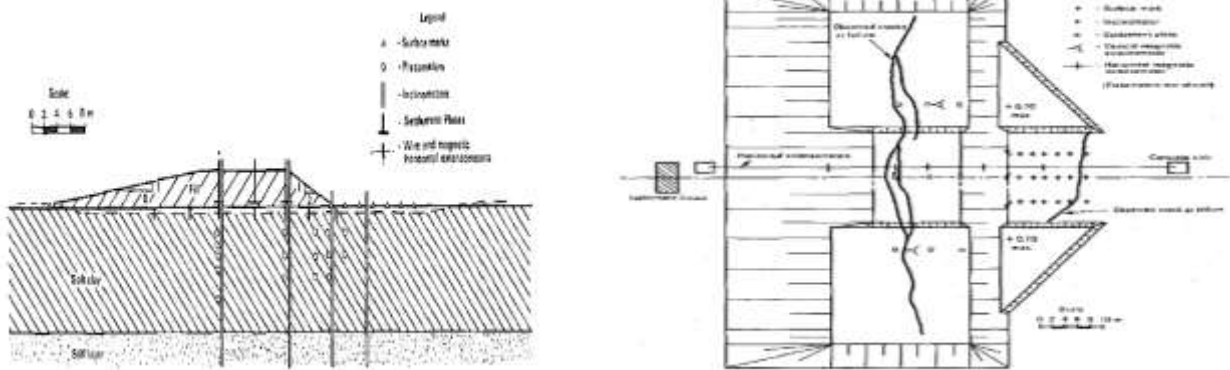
Plan and Instrumentation scheme of the embankment (Ortigao et al. 1983)
